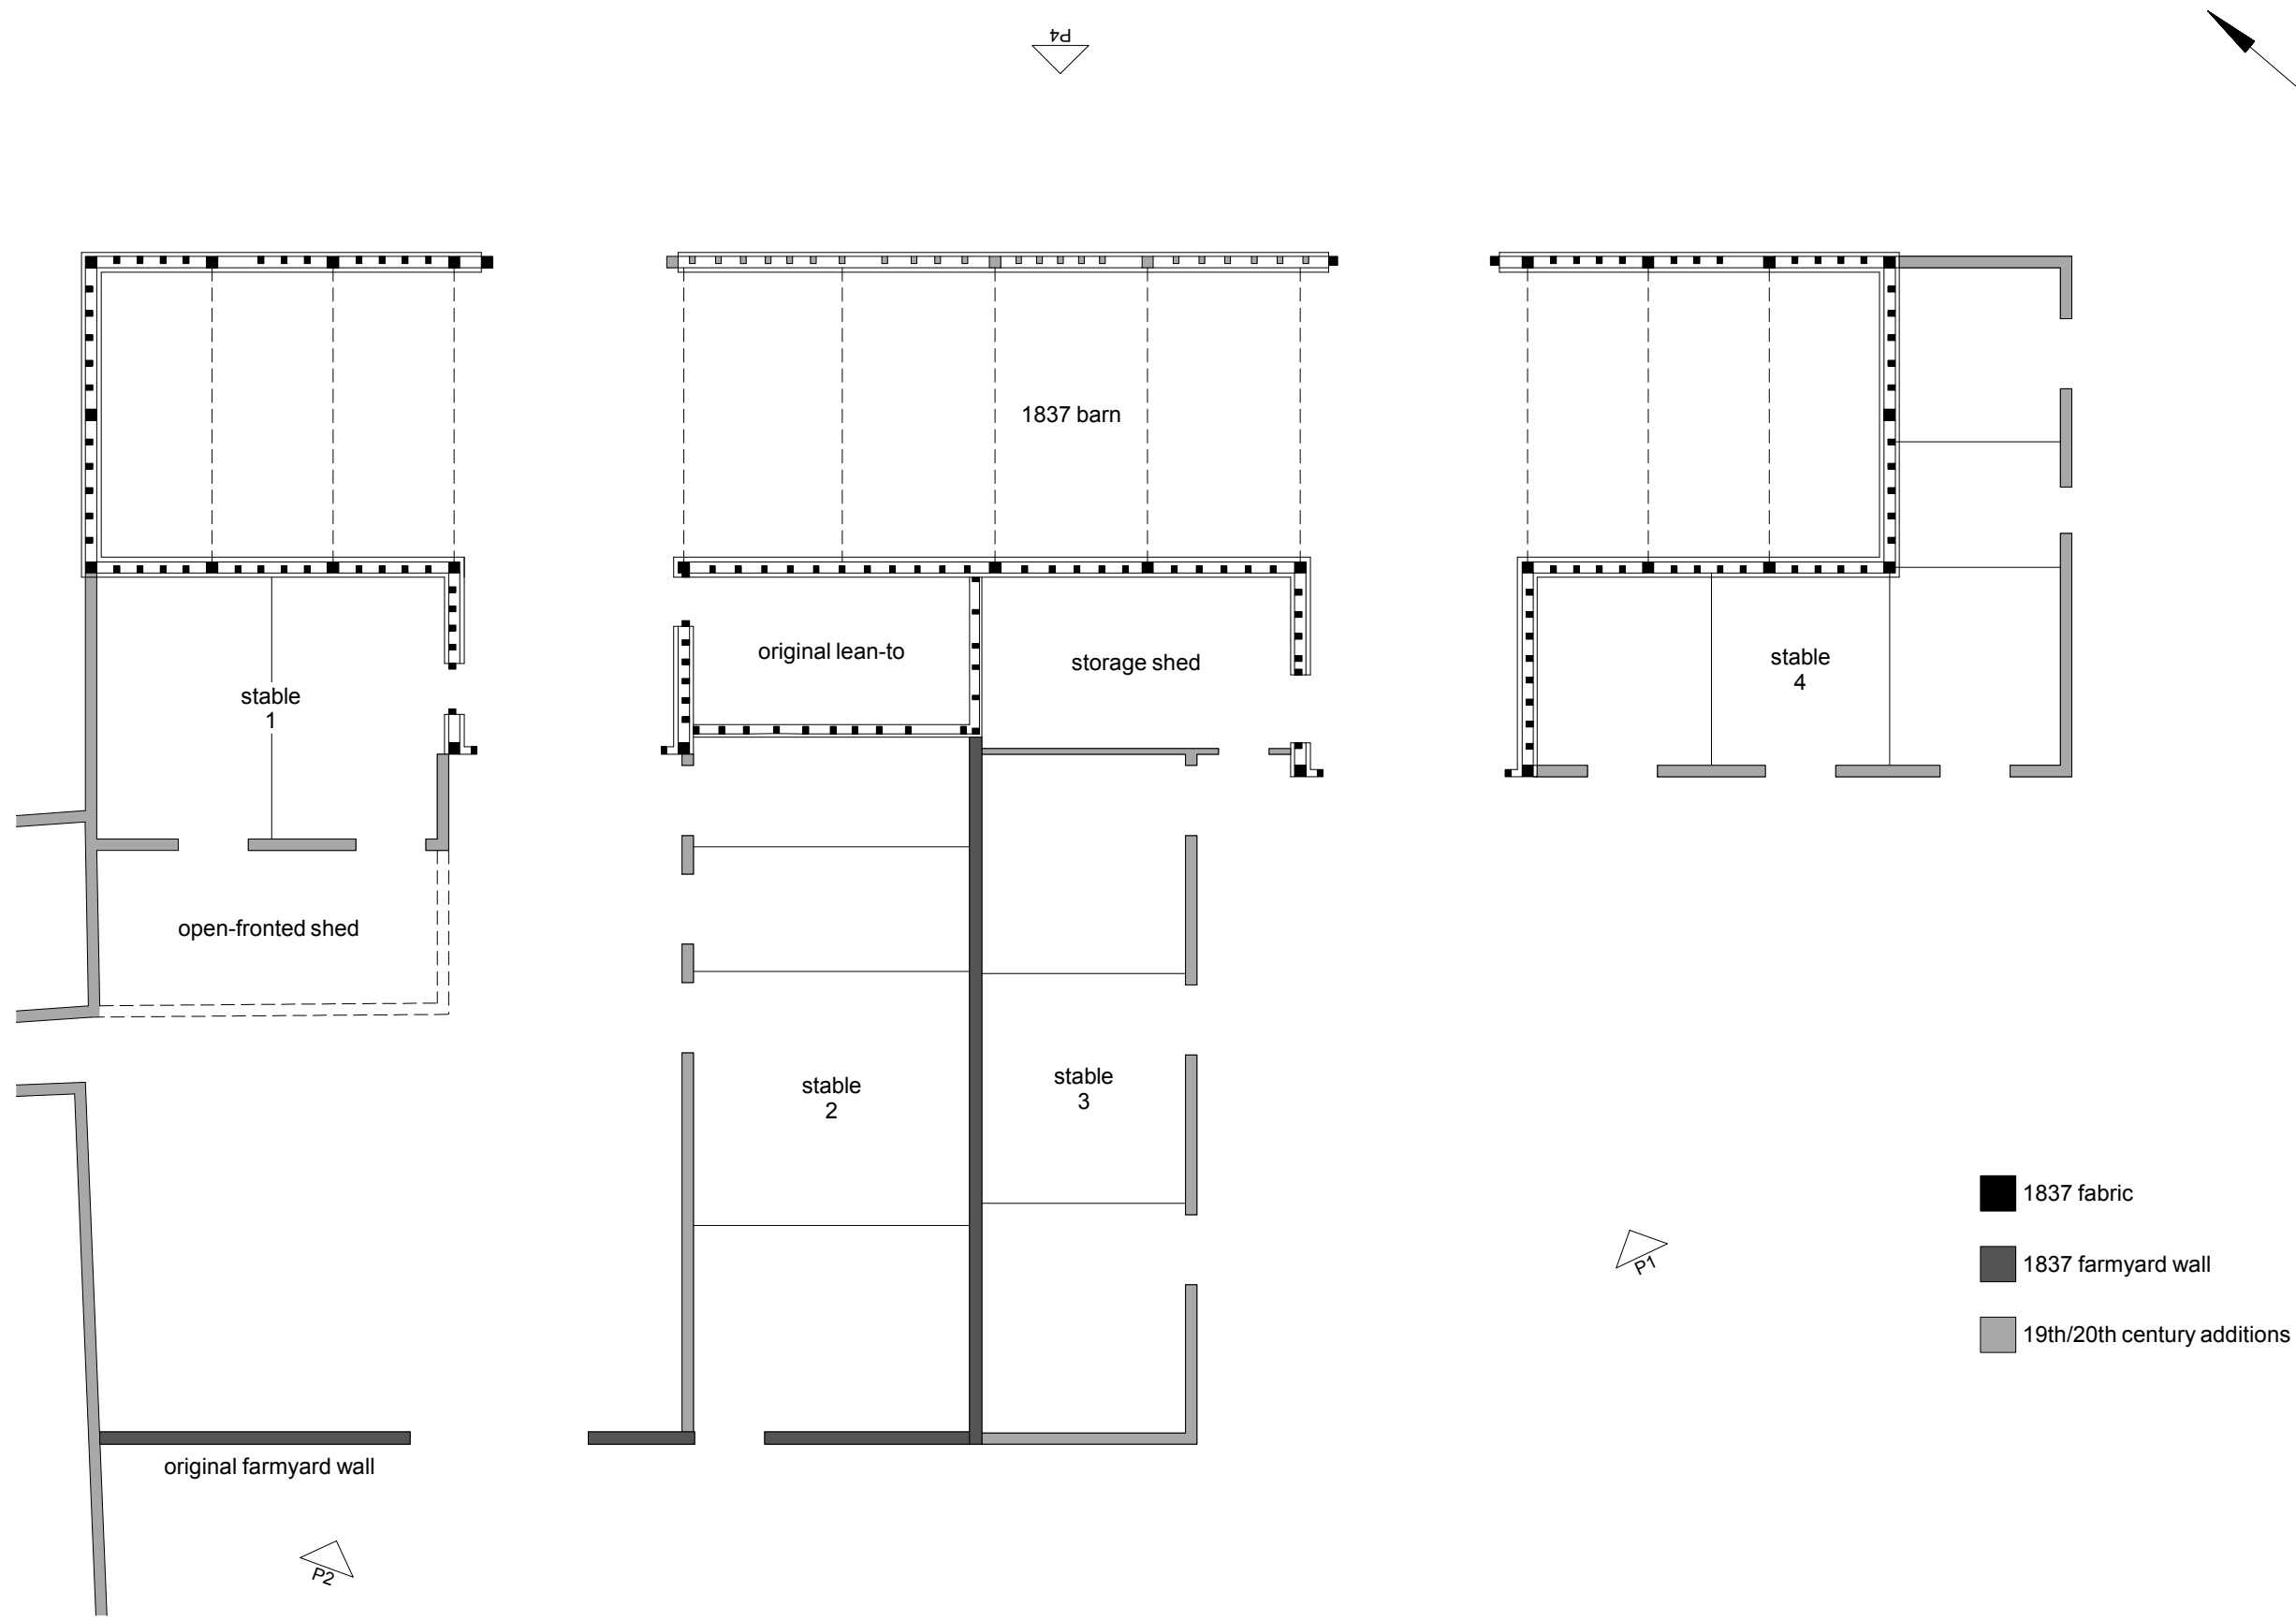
Block plan of Highfields barn with later additions shaded grey and the farmyard wall shaded dark grey. The location and orientation of photographs included in this report are indicated by the numbered arrows.
